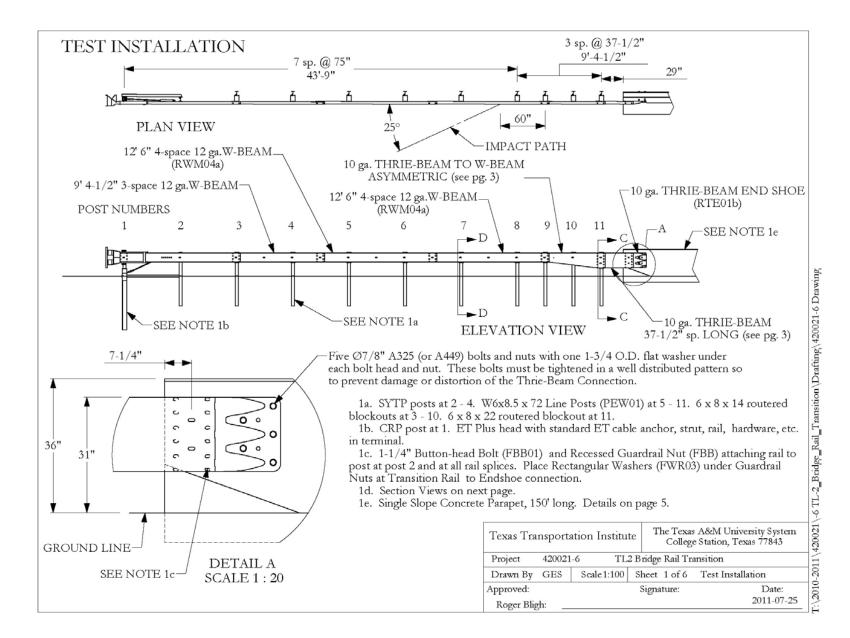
MASH TL-2 Thrie Beam Approach Guardrail Transition
